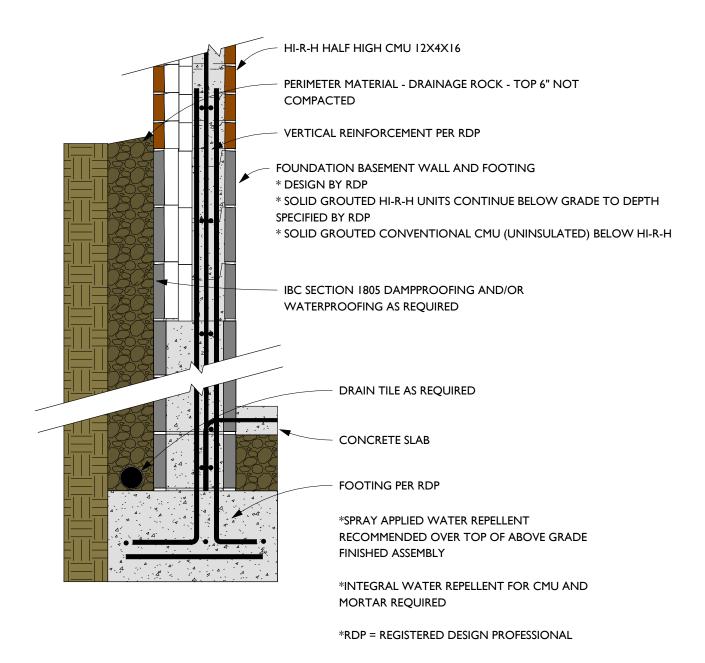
HI-R-H Half High - HI-R-H Foundation
